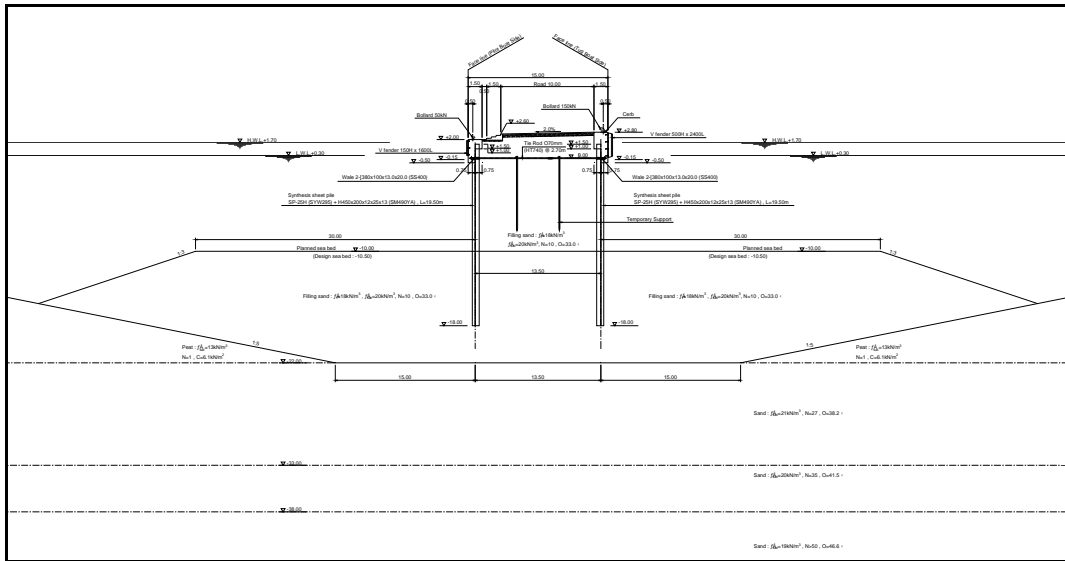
Typical Section of -10m NSQ (W-wall part)
